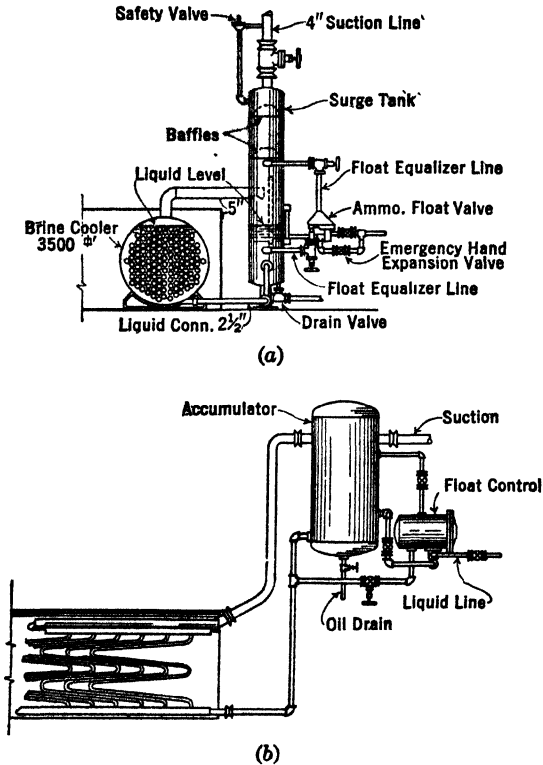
Ice manufacture. (a) Shell and tube cooler. (b) Headers and short connecting pipes.
